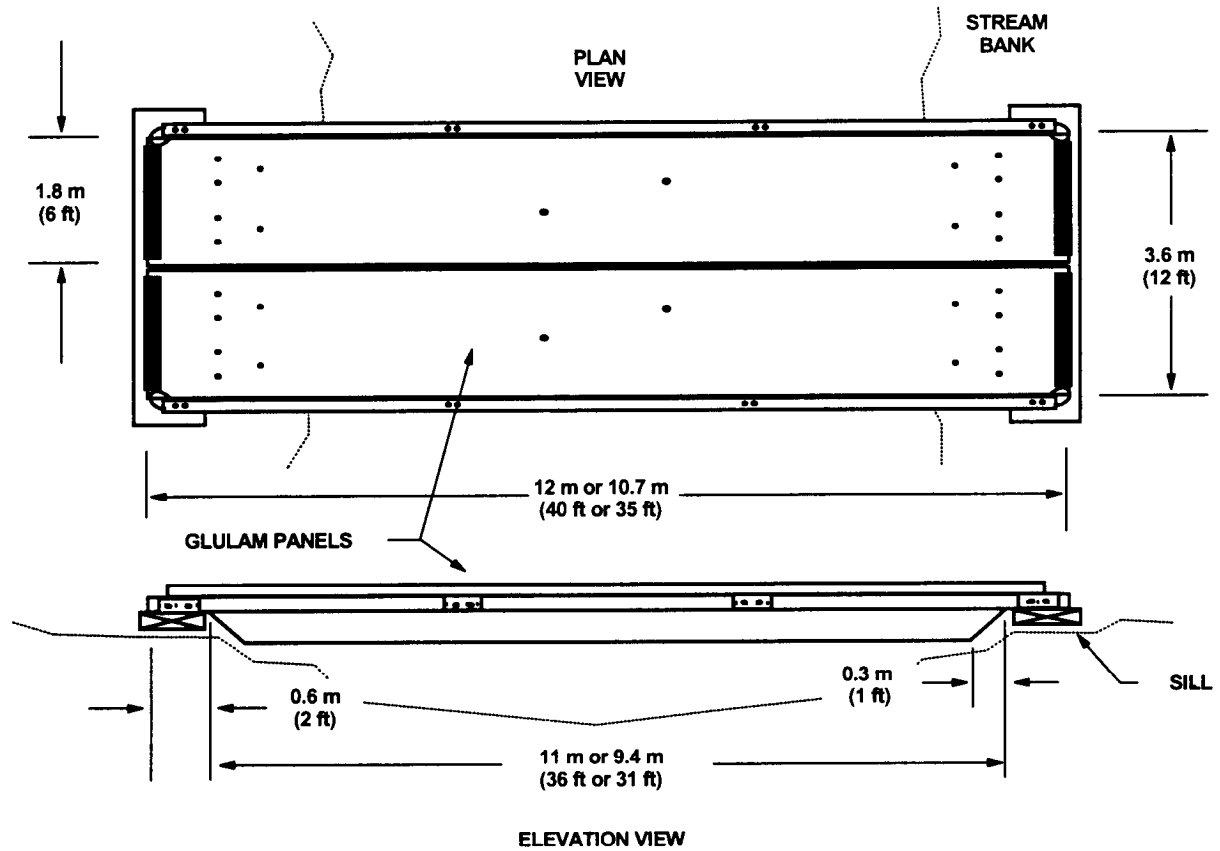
Sketch of the bridge installations showing overall dimensions of the portable longitudinal T-section glulam bridges.
